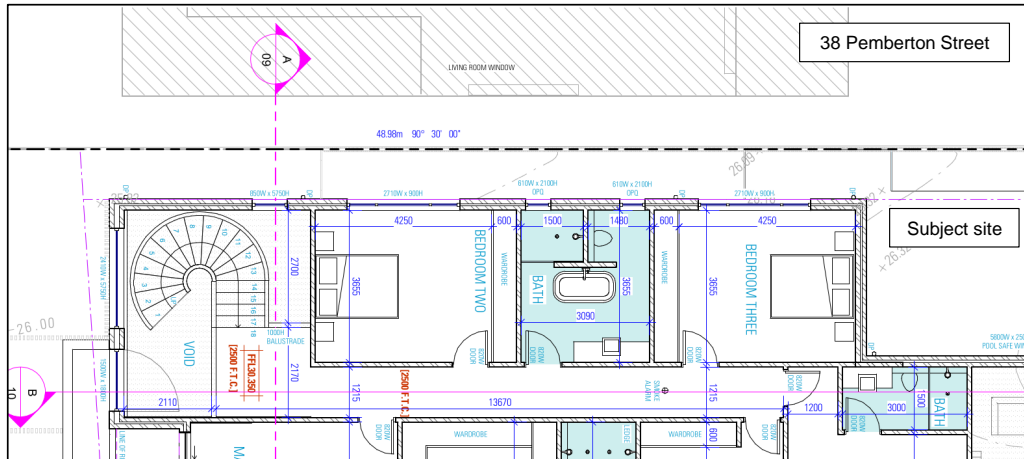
Proposed First Floor Plan showing insufficient horizontal offset from adjoining property
